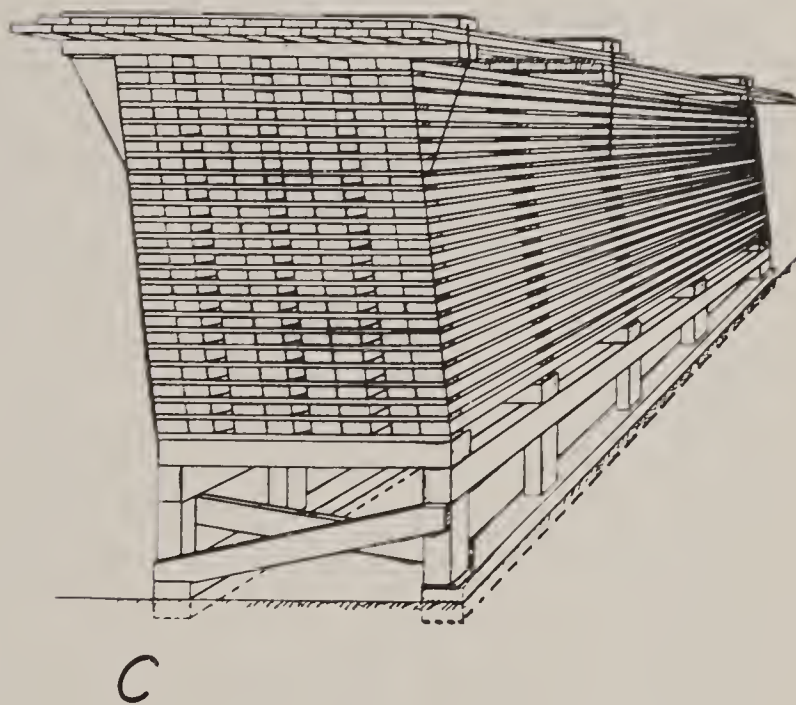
Pile roofs projecting at front end of pile.
